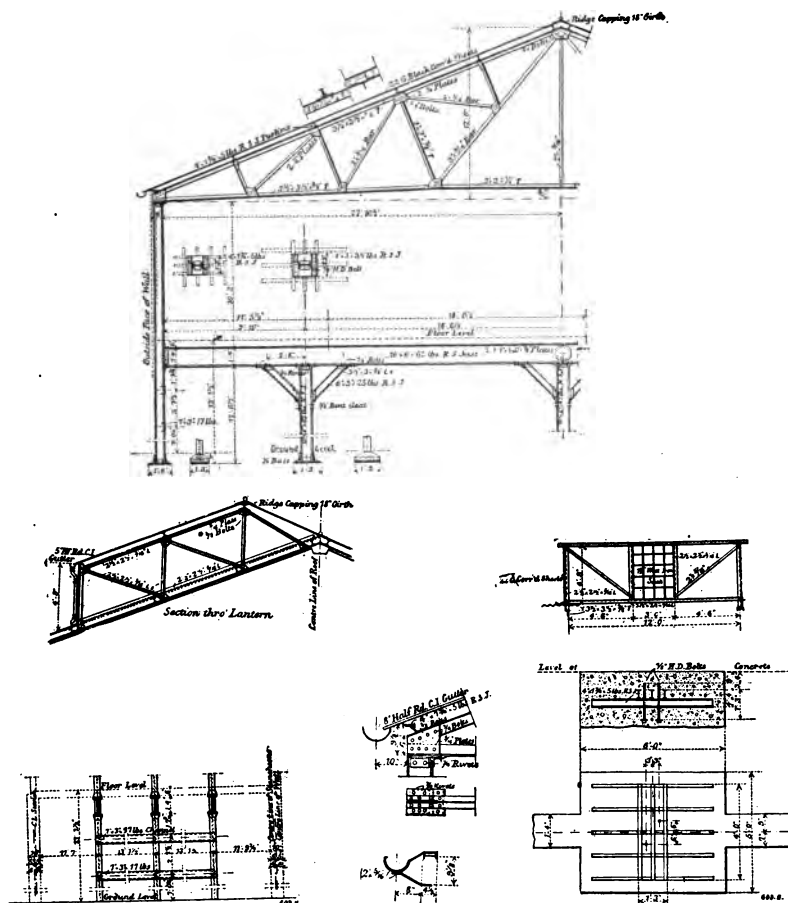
DETAILS OF CONSTRUCTION.
